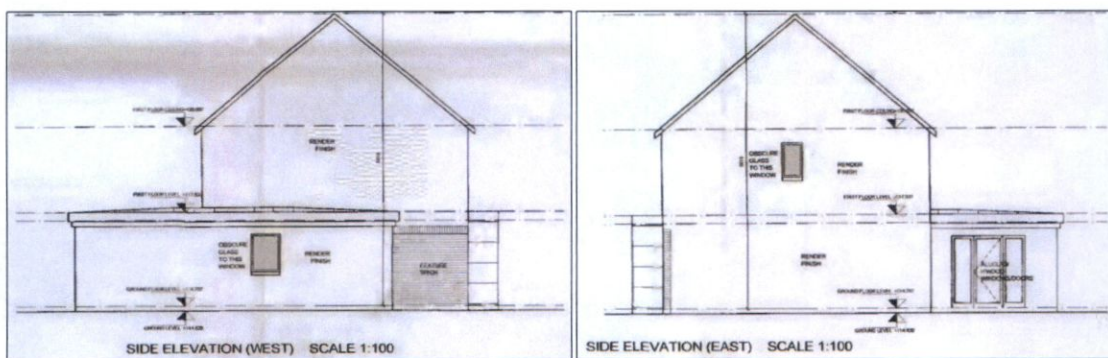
Elevations refused under Reg. Ref. SD19A/0128 and ABP Ref.307316-20. West elevation (left) and east elevation (right).
